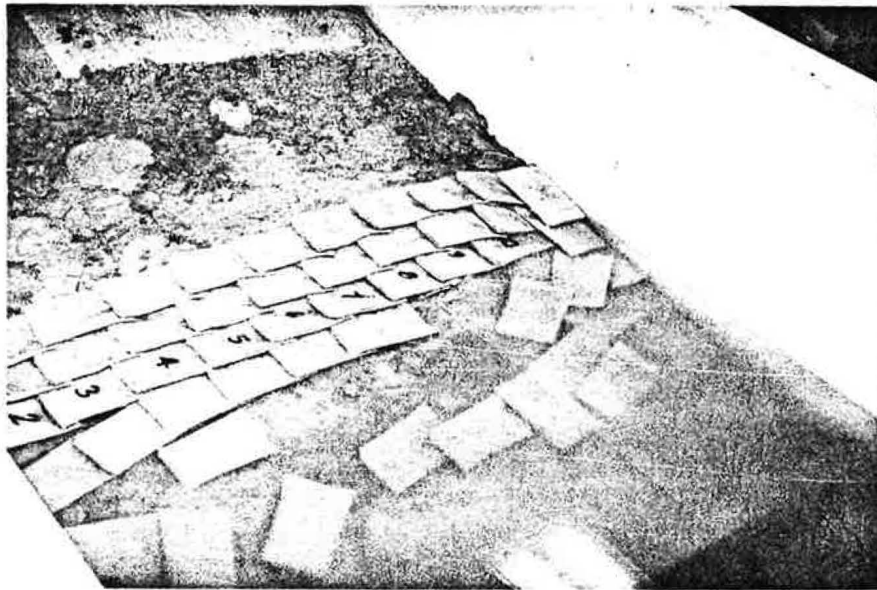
Typical Model Failure, Slope: 1 on 4, Test No. 9.
